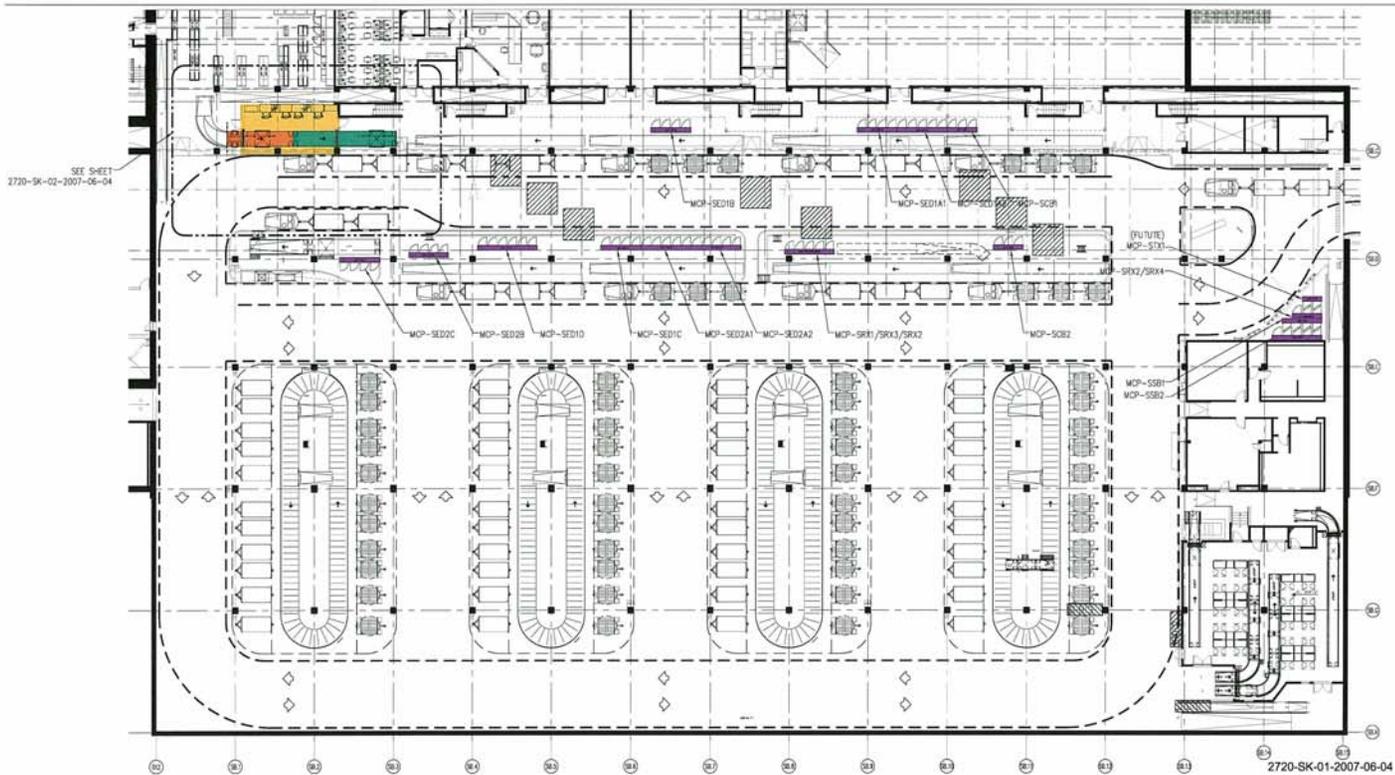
[REDACTED] - Baggage Handling Services - BHS Location Plan
